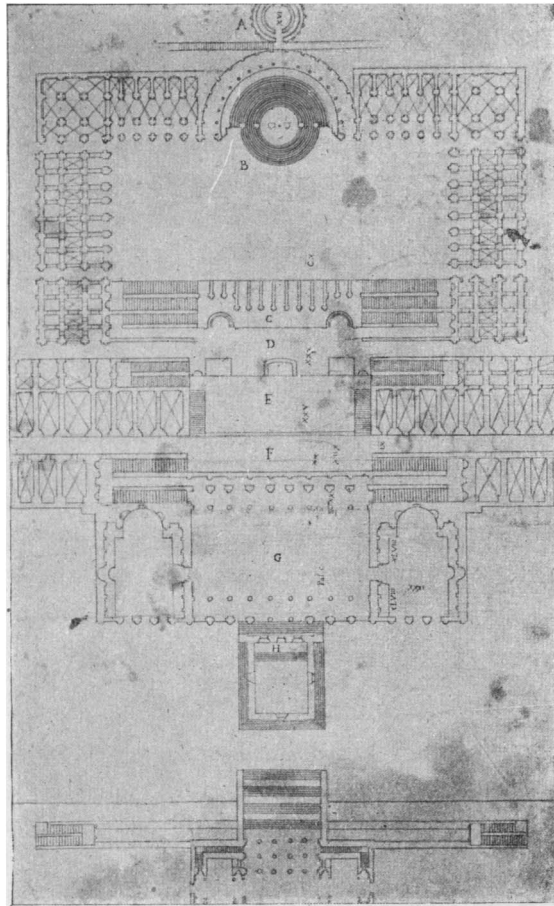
VIENNA COPY OF PIRRO LIGORIO'S PLAN.
